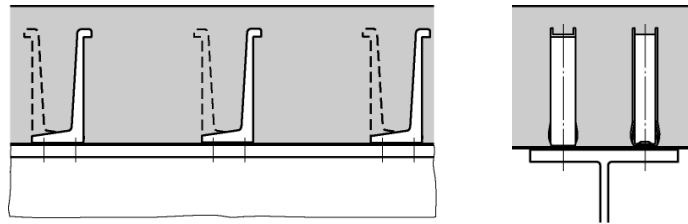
Nailed shear connector with solid concrete deck and orientation parallel to beam axis
